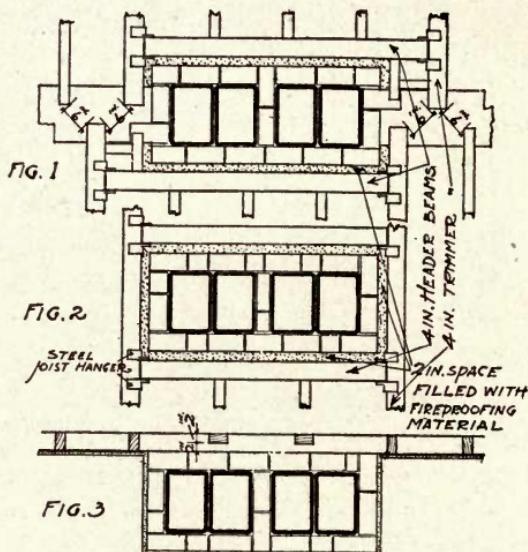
Method of building two fireplaces back-to-back in a brick party wall to secure proper spacing between ends of floor joists. The space between backs can be filled if desired.
